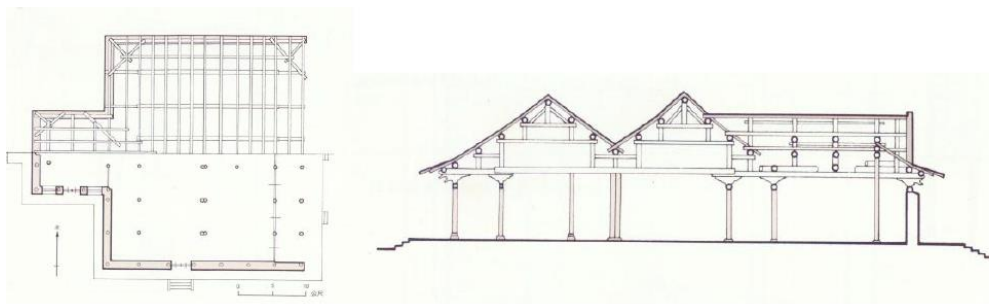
The floor plan and the section of the prayer hall. (Source: Liu, 2011)
